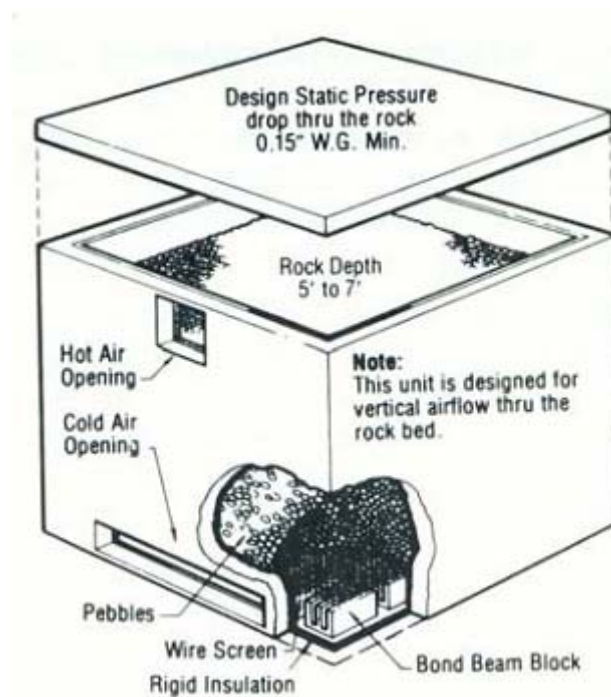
A typical packed bed storage unit (Solaron Corp) [6].
